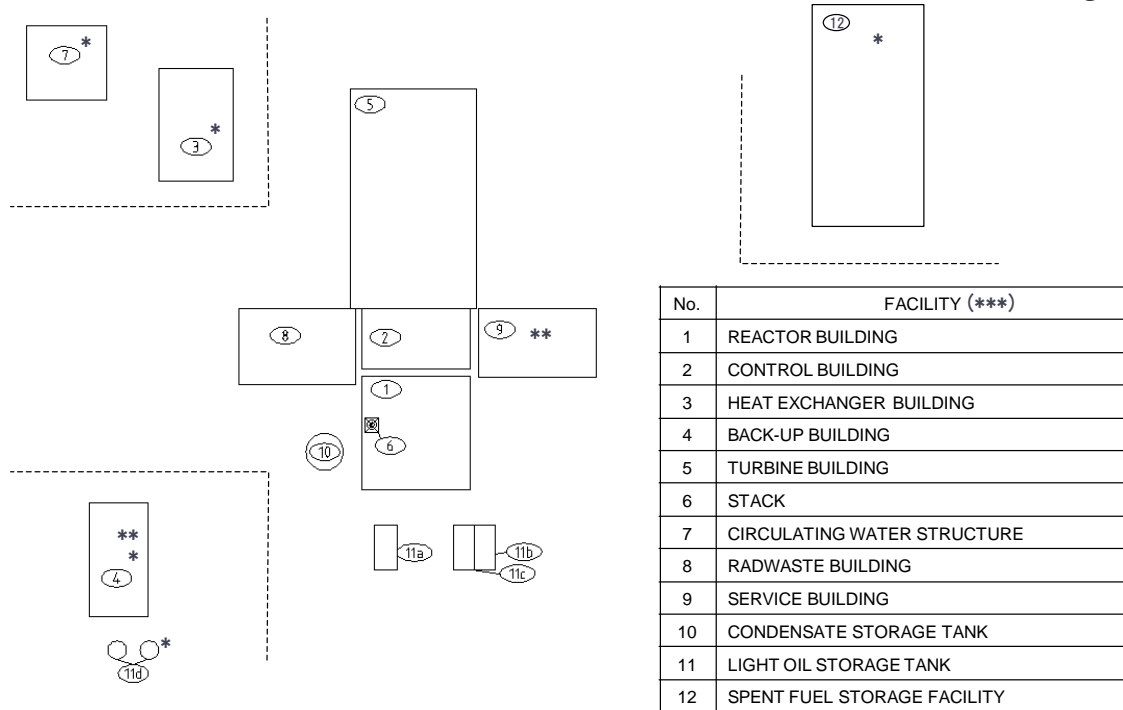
UK ABWR Power Station GDA Site Layout
